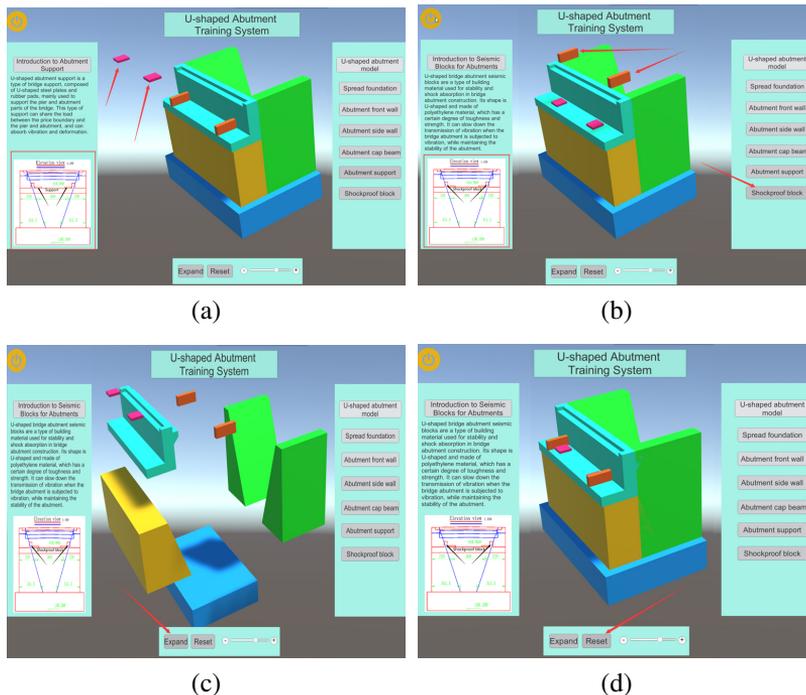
Display of disassembly and assembly process; (a) Support pad disassembly, (b) Anti vibration block disassembly, (c) Expand All Components (d) Reset
